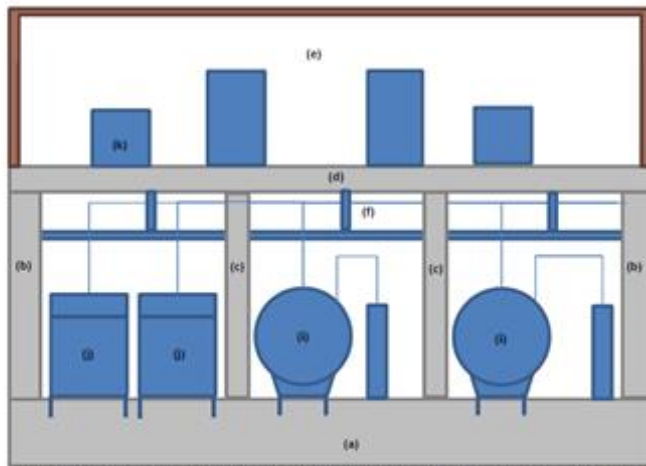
Vaporisation Facility cross section (looking West, with East external walls removed)
